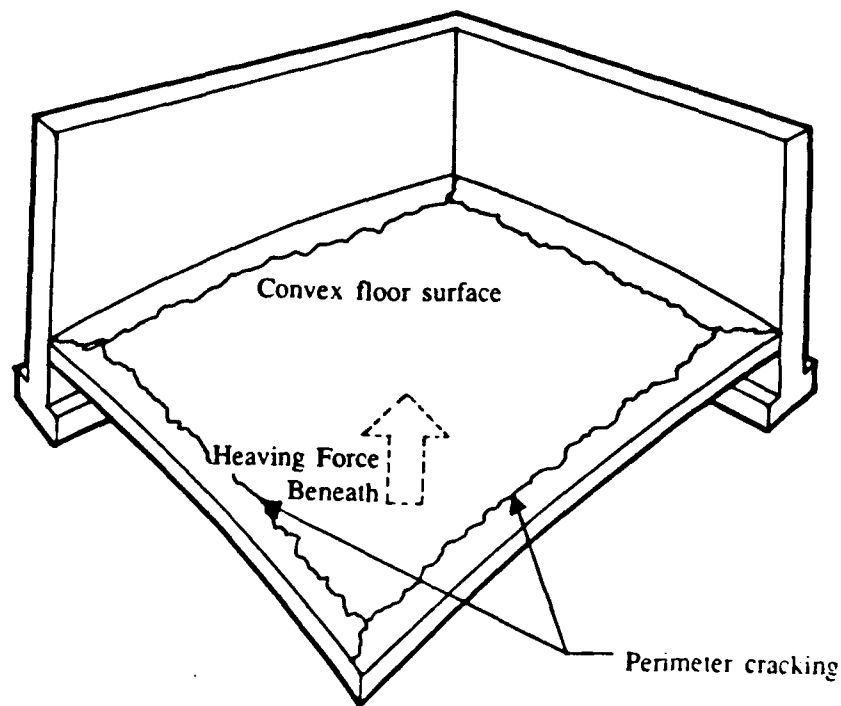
Heaving soil under a floor slab causing a convex floor and perimeter cracking.
